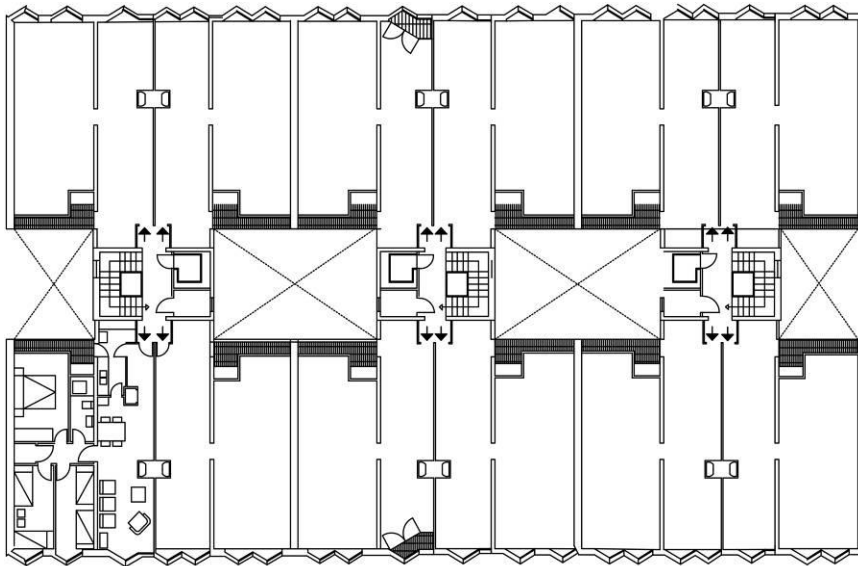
MBM. Housing building in carrer Pallars. Typical floor plan. Source: Redraw by M. Lucchini.
